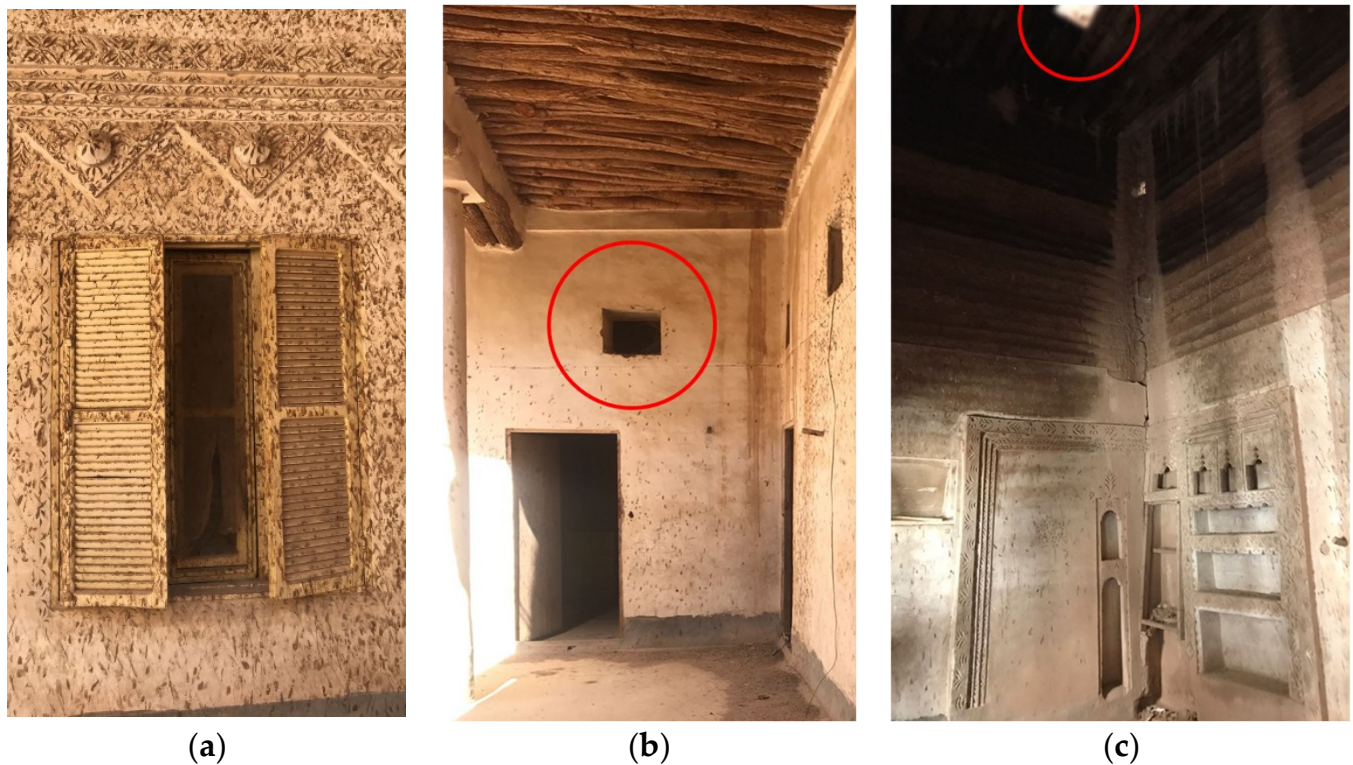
(a) traditional house window; (b) traditional passive ventilation opening; and (c) traditional roof ventilation opening (chimney).
